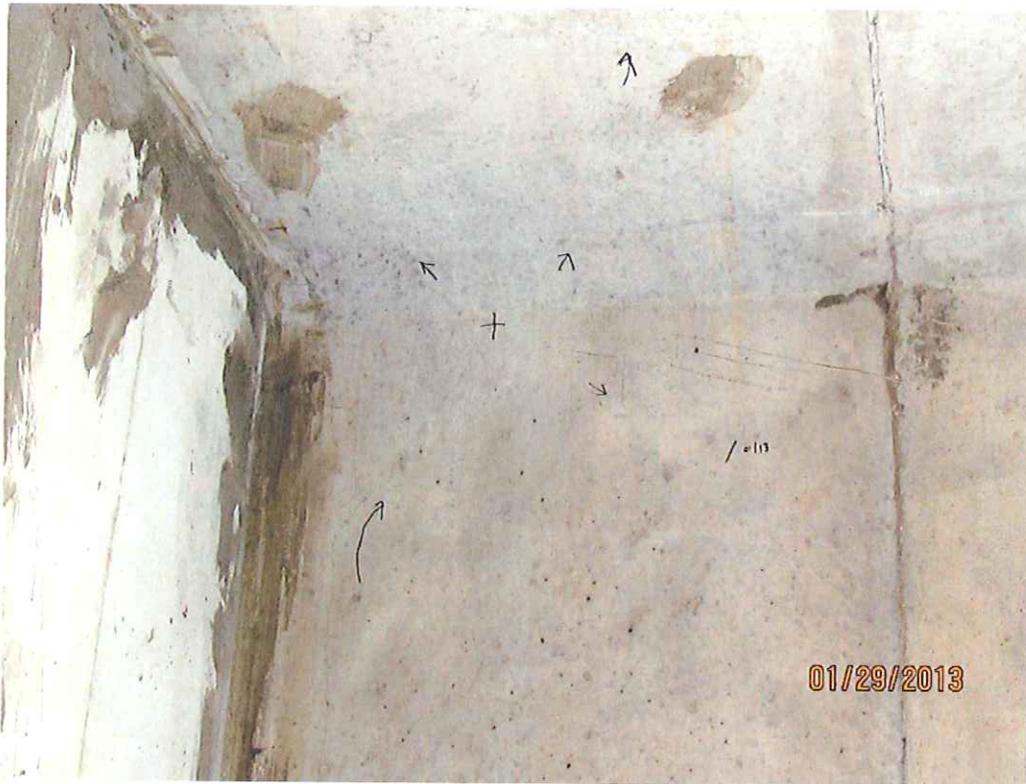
Intersecting cracks on east face at north end of Beam 11-2
